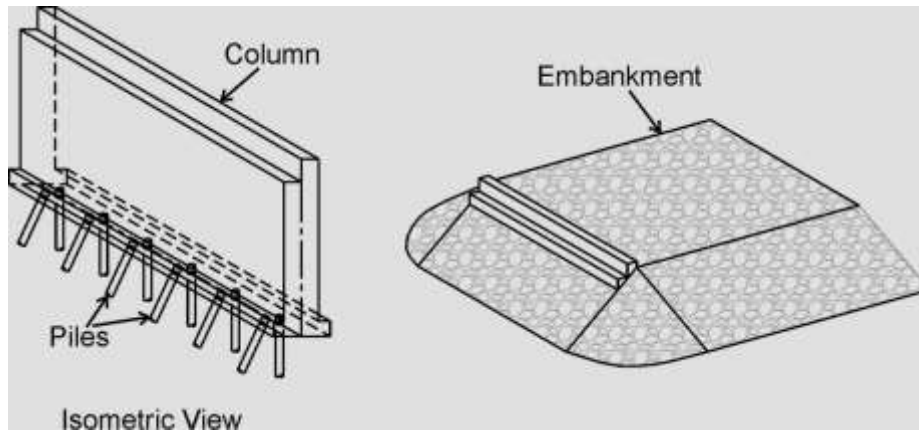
Isometric view of spill-through abutment comprising a standard-stub column located within the end of an earthfill embankment
